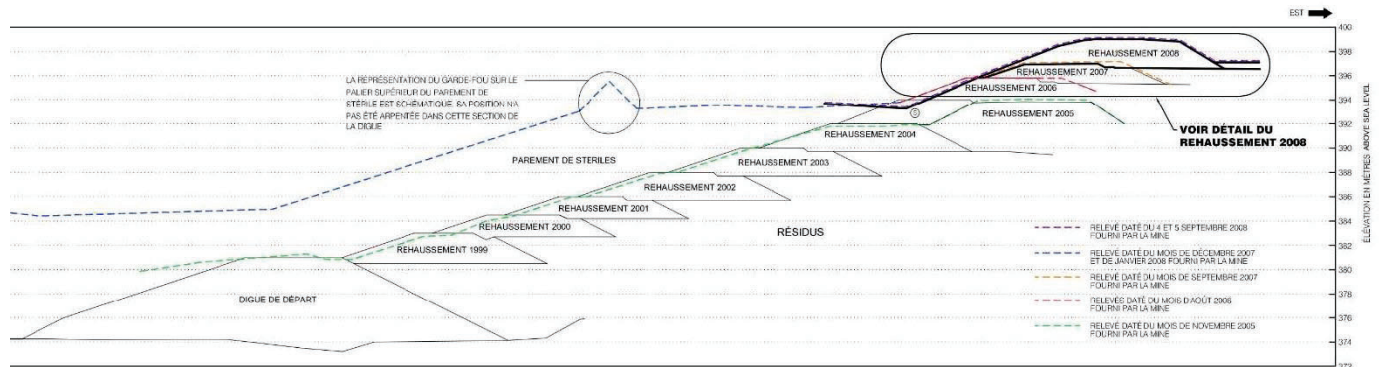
Typical Cross Section of the existing TSF Dyke Raise (WSP, 2024a)
